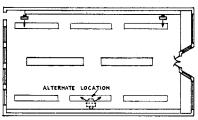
Typical installation of horizontal air discharge unit heaters in retail store. Low speed units are best suited.
